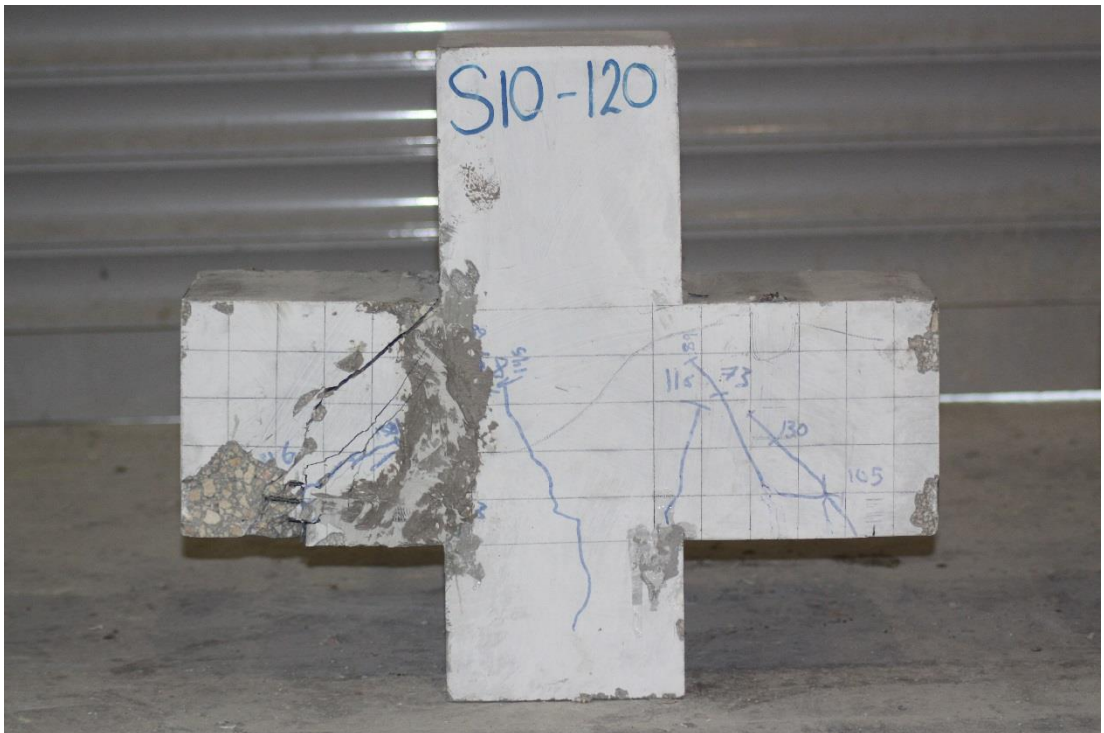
Unconfined (Specimen S10 - 120) after testing
